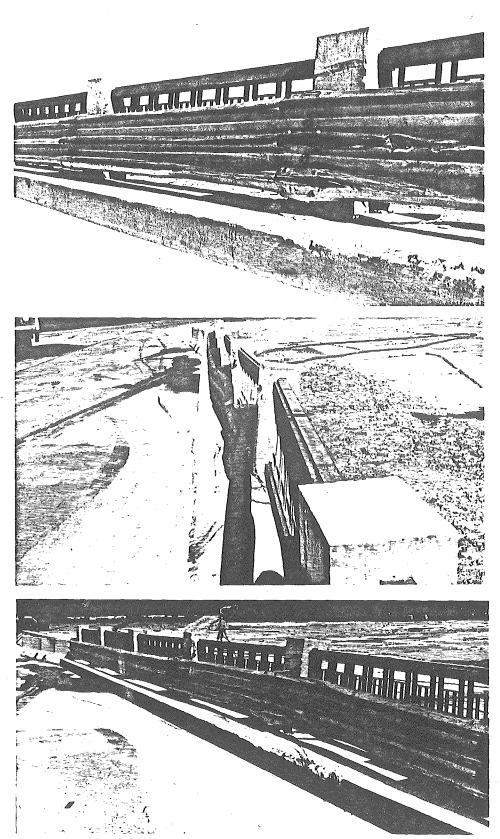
Posttest photographs of bridge rail system, test 1952-2-89.
